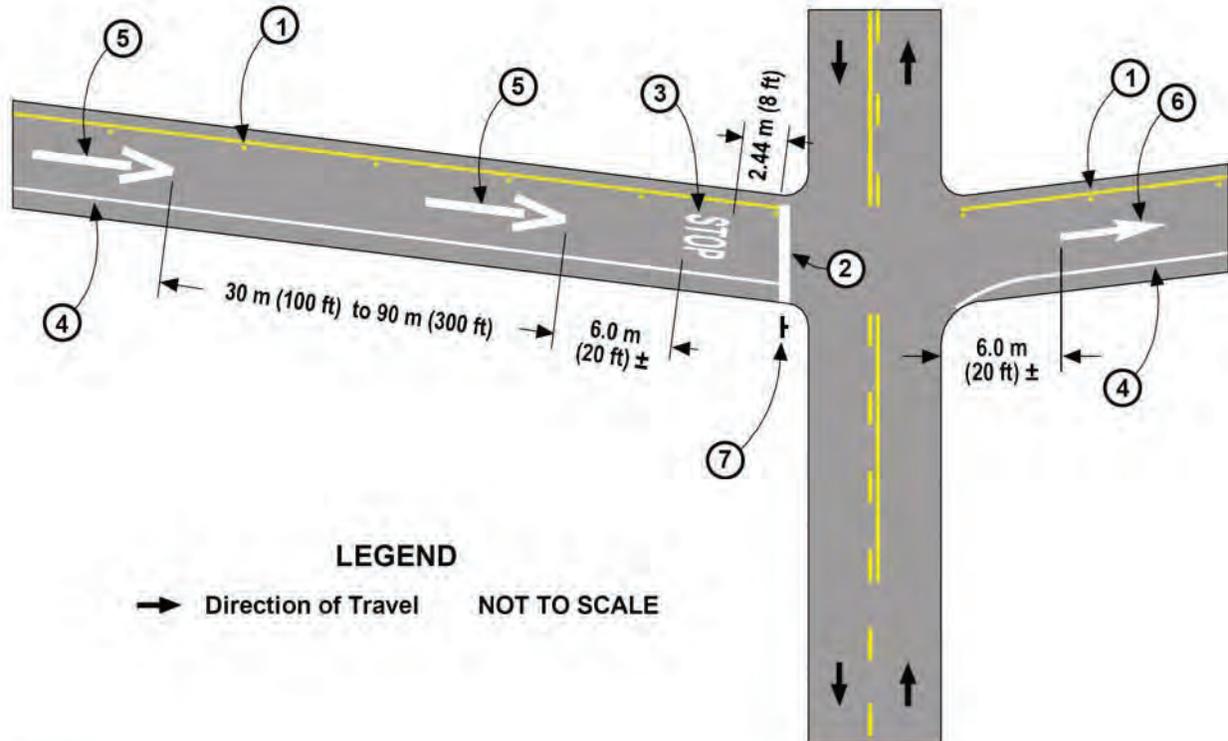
B-23 (CA). Examples of Entrance/Exit Ramp Terminal Signs and Pavement Markings (Sheet 1 of 6)
